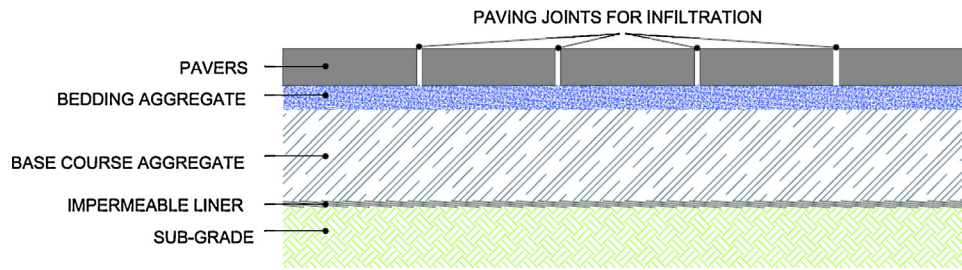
A cross section of a permeable pavement with underlying reservoir.
